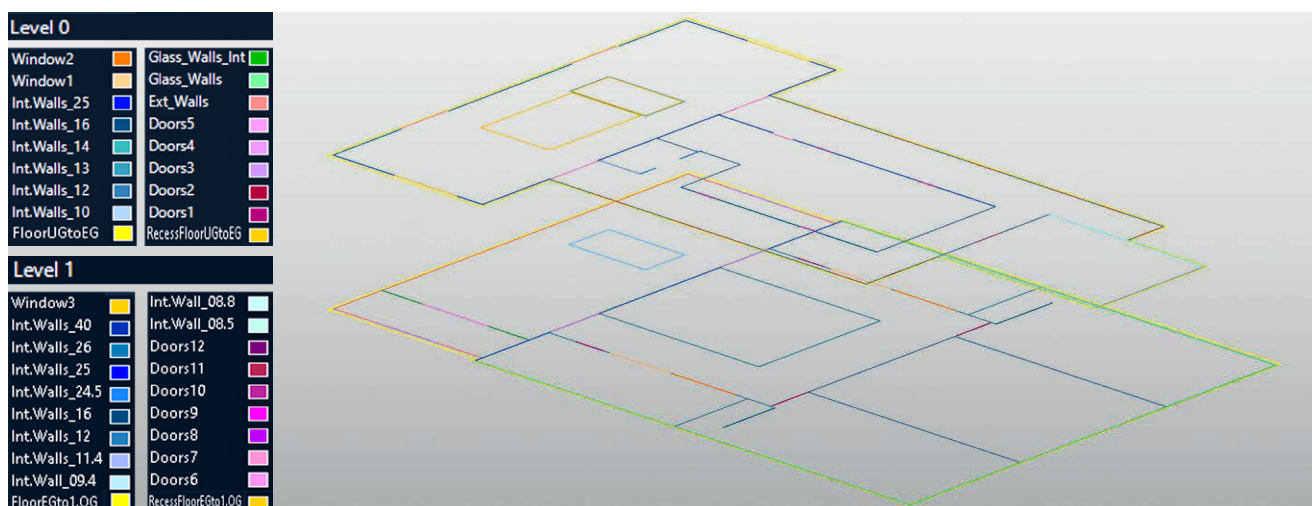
Layers of the building elements and floor plans for level 0 and level 1
